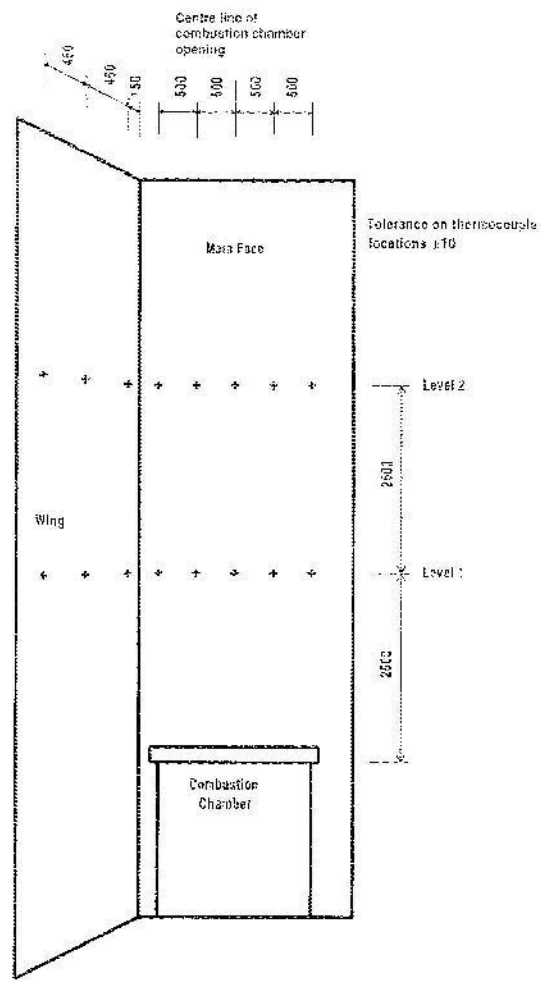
Location of thermocouples (all dimensions are shown in mm)
